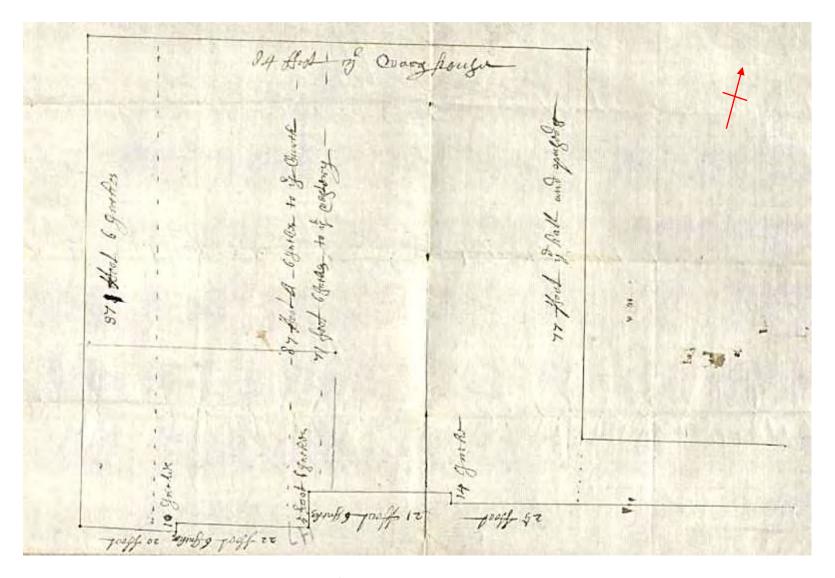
'Draught of Stationers' Hall Garden', late-C17, attributed to 1690/1. This drawing shows a substantially larger garden. The north-south dimension shows "87 foot – 6 inches to ye church" [26.67 M], and "71 foot – six inches to ye vestry", some 5.5 metres less than that seen today, indicating that the western range was once substantially narrower (Detail) (TSC-1-G-06-02-08).
